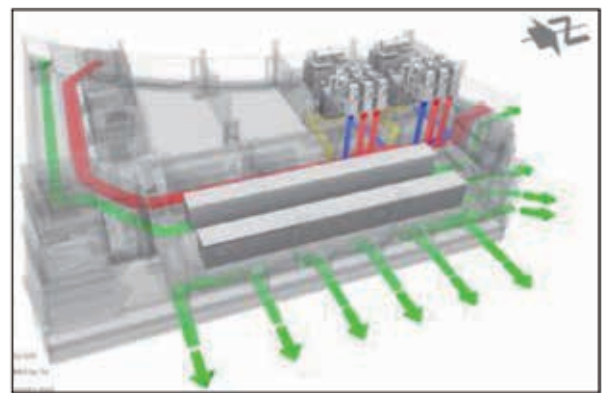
BIM Image of a Substation including Dispatch of Underground Cables from Substation to Customers
